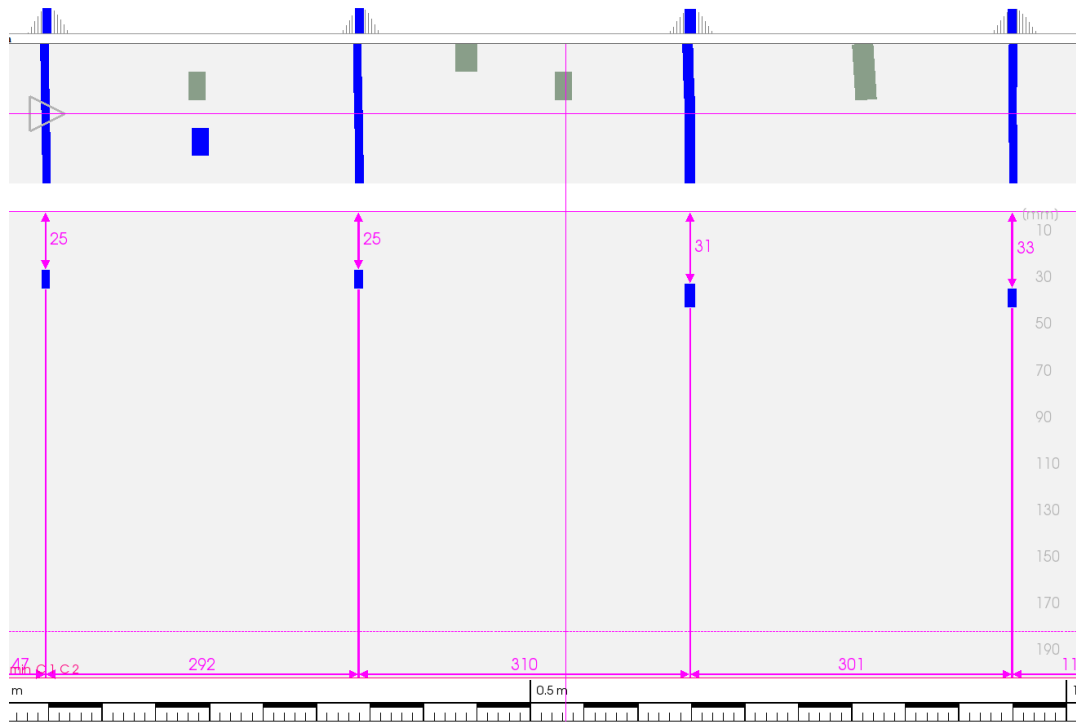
Ferro scan of precast concrete cross wall showing reinforcement spacing and cover.
